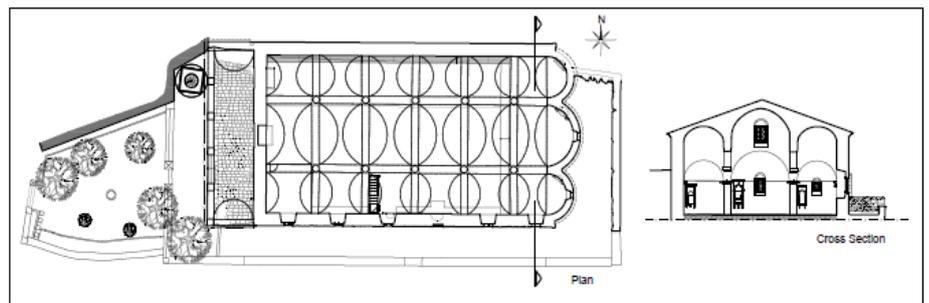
Plan and section of Ferteck Church (Alper Restorasyon)
